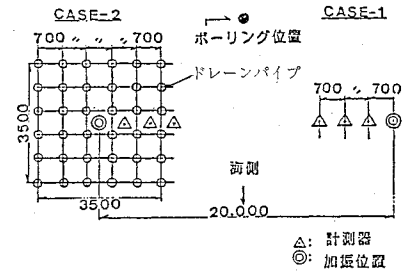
Plan of field tests and arrangement of measuring instruments.
